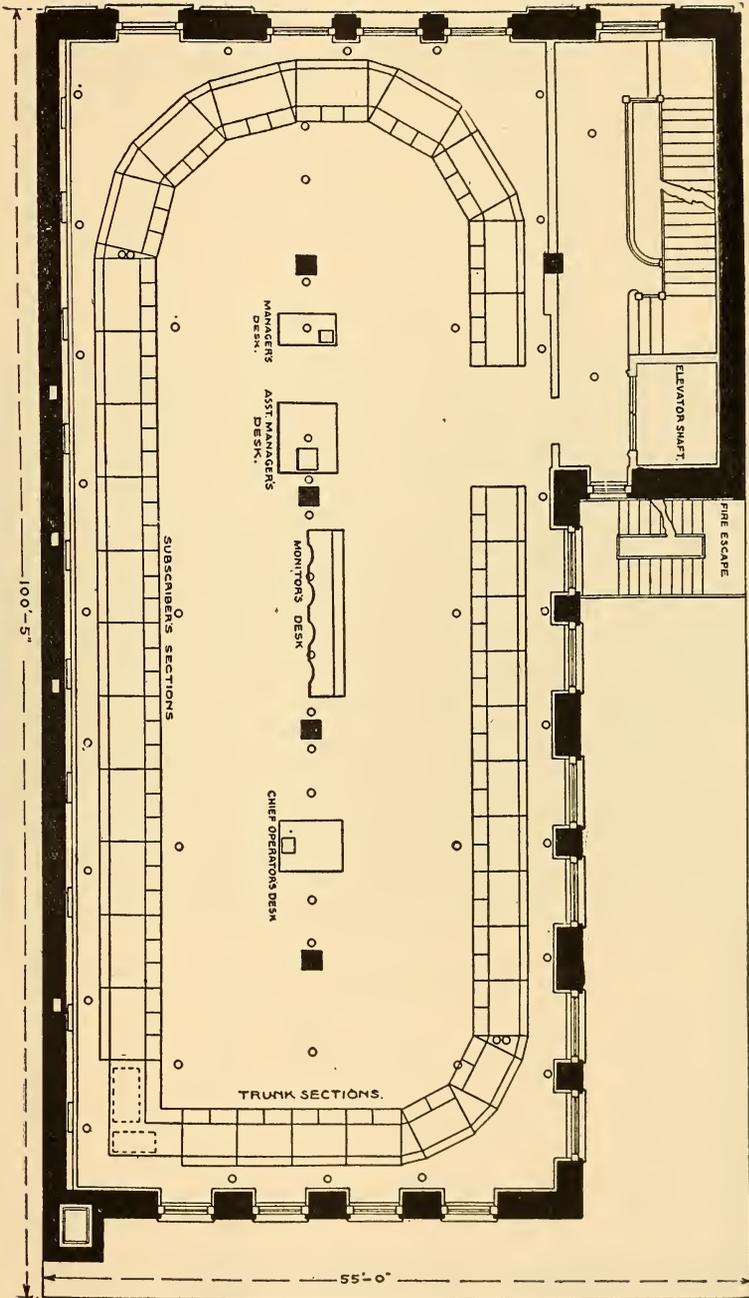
shows a plan of the fourth floor, which is devoted entirely to the operating room containing both the subscribers' and trunking sections.
